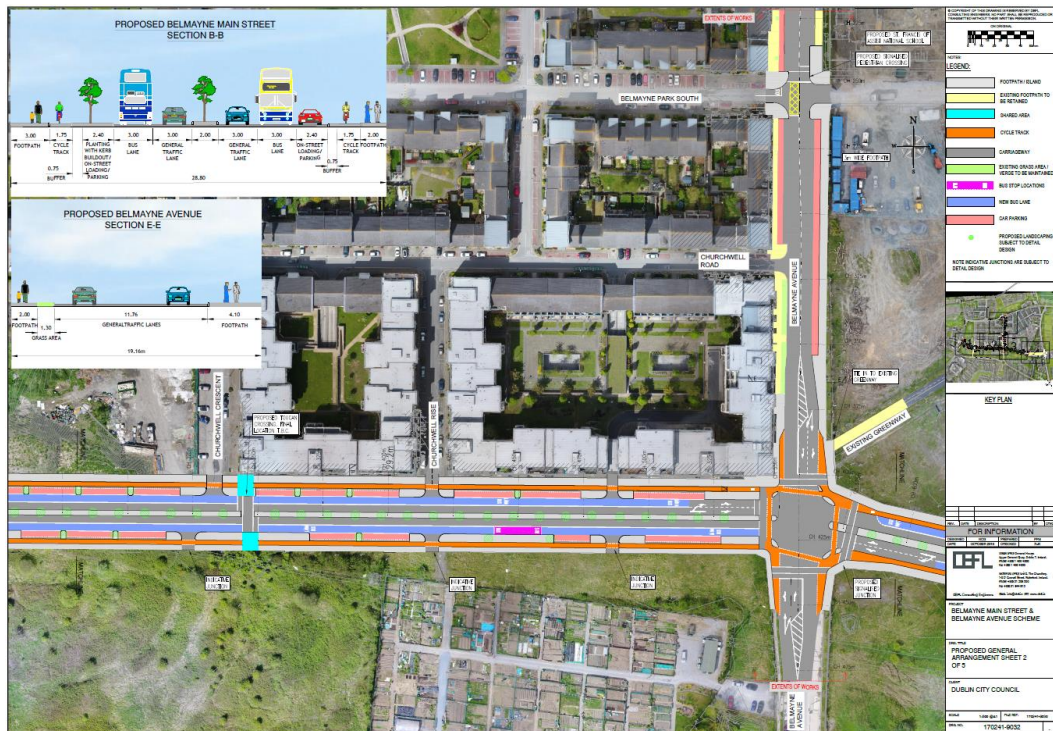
Proposed Design Layout & Cross Section for Belmayne Main Street
